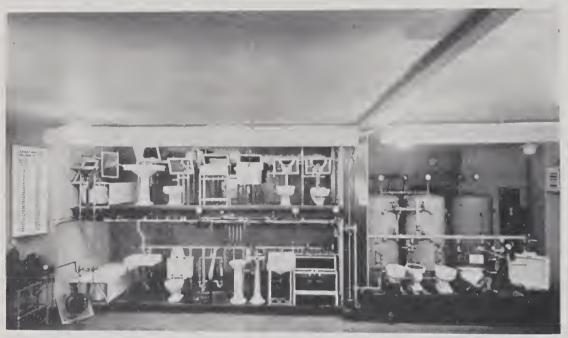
Testing plumbing equipment, Bureau of Engineering, Chicago, Ill. (Courtesy, E. J. Zimmer.)
